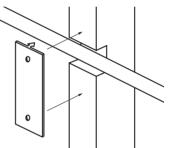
Installing a nail plate to protect wiring in a notched stud.
